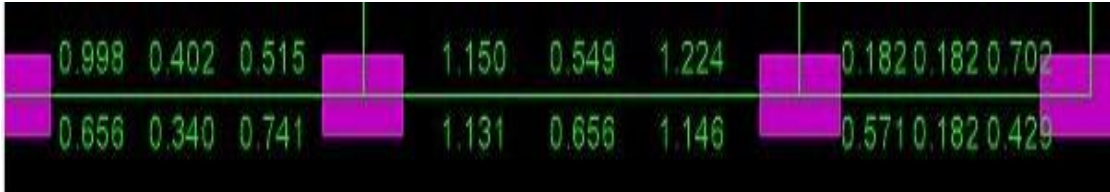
Reinforcement Area of 4th FLOOR (Y-Axis)
